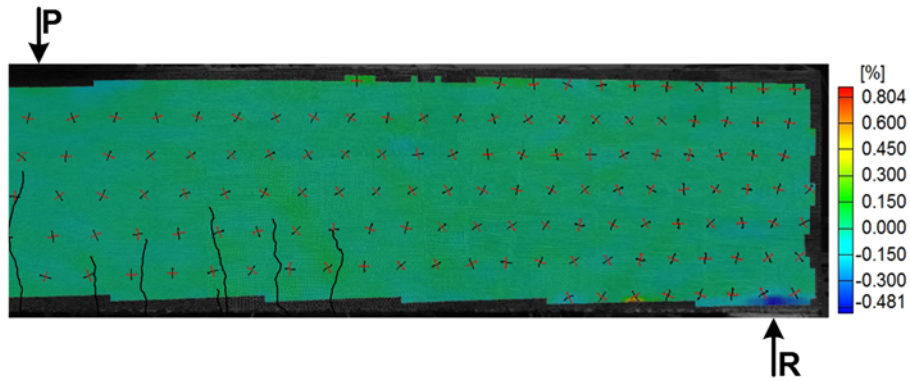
Full-field concrete transverse strain ( $\epsilon_y$ ) across shear span for specimen RC18b at load 30 kips
